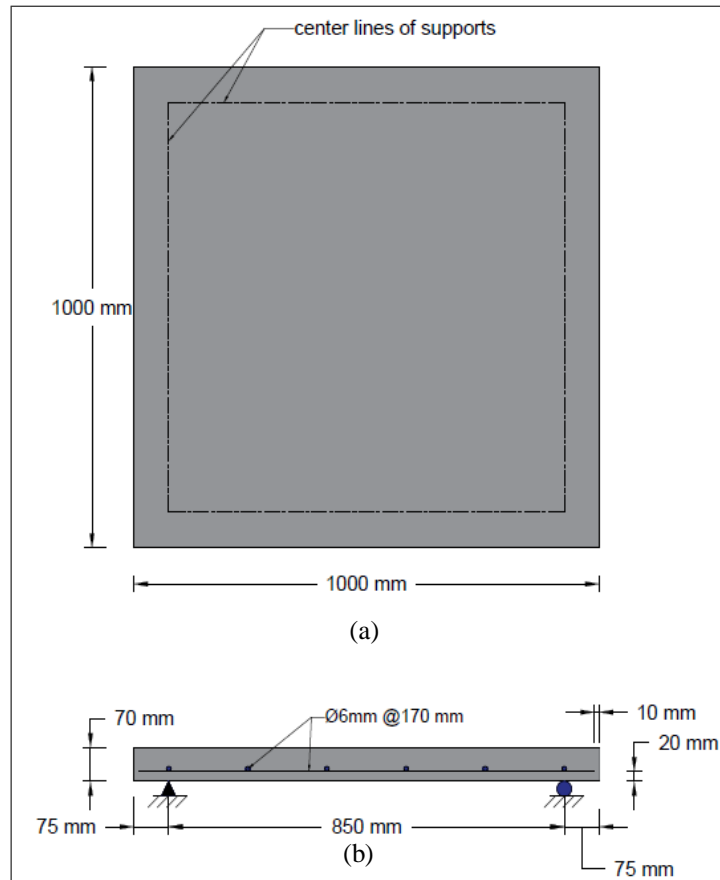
Dimensions and other details of the slab specimens: (a) Top view, (b) Sectional view
